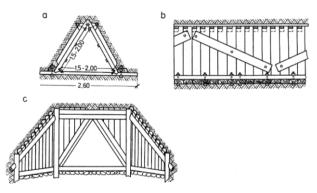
Provisional culvert with a triangular cross-section made of railway sleepers (Cholewo & Sznurowski, 1970; Miklin & Sawicki, 1993): a – cross-section, b – side wall reinforcement, c – view from the inlet to the culvert
